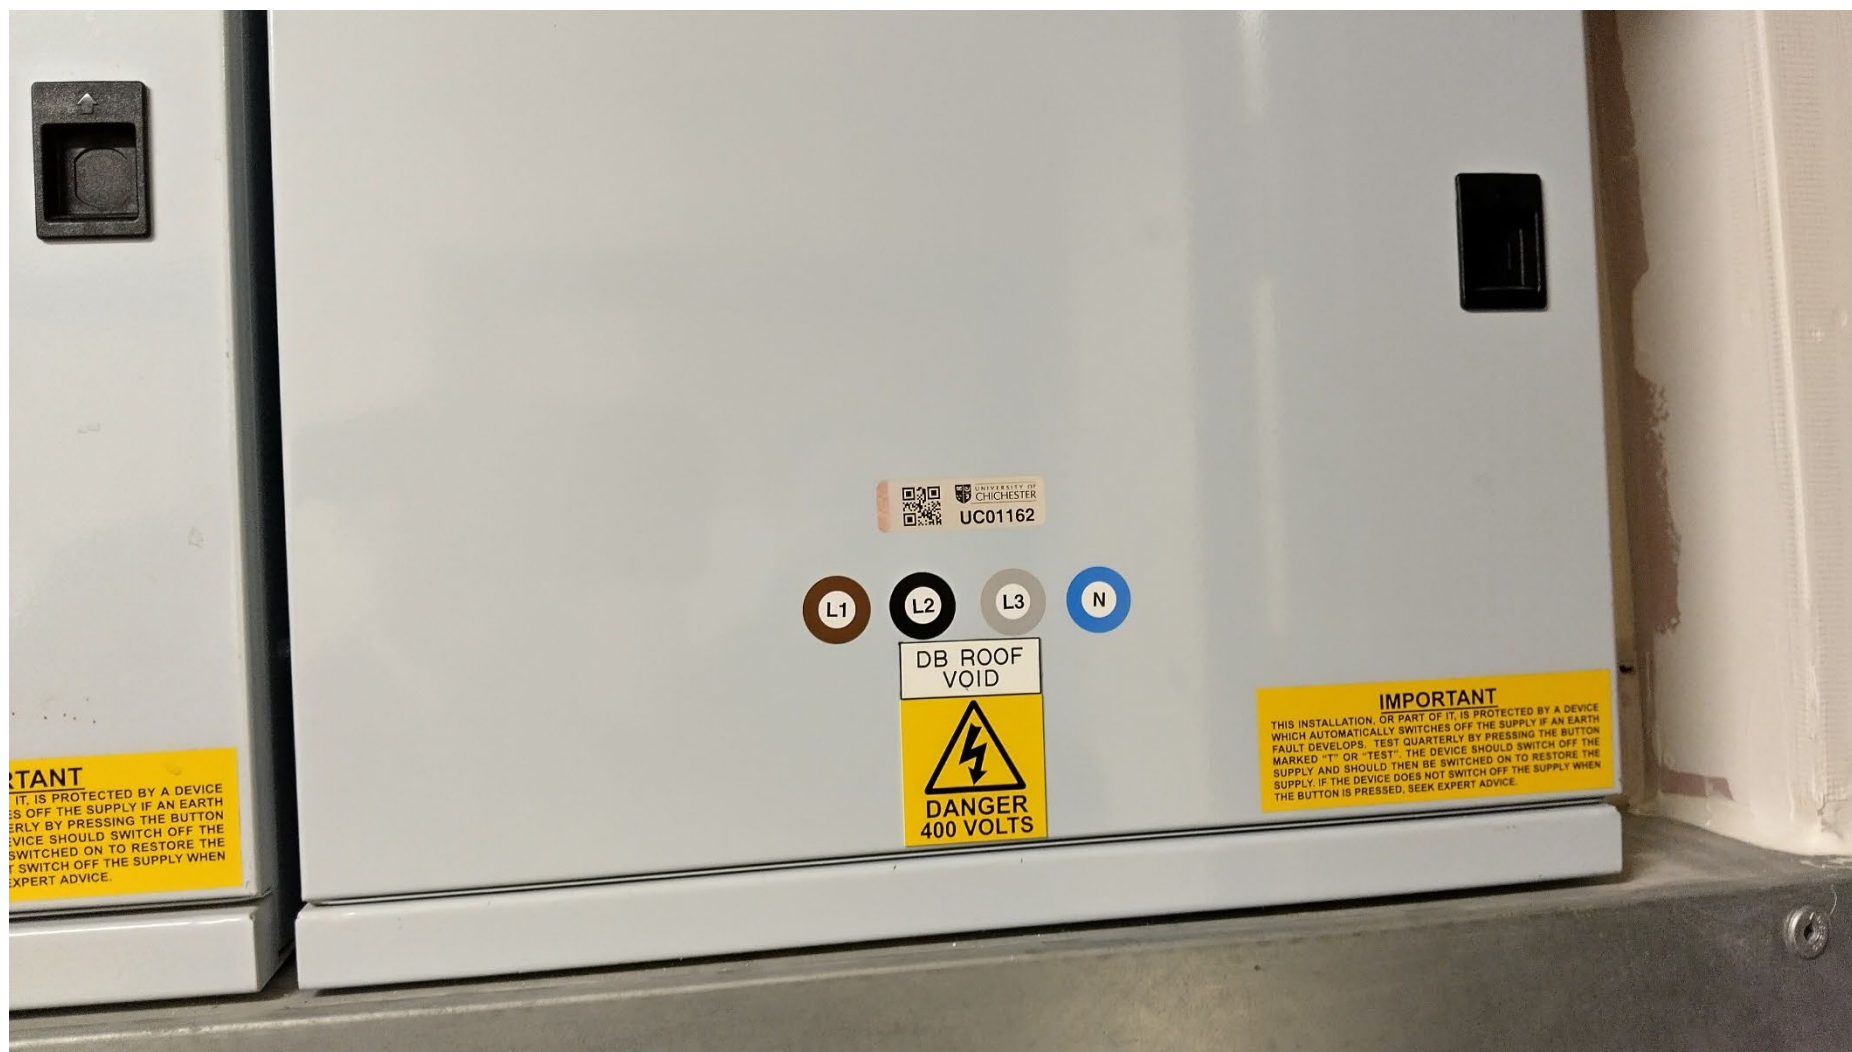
Currently lightly loaded "DB Roof Void" board on top floor supplying loft space (dedicated supply to this from main intake) – Amberley Hall
